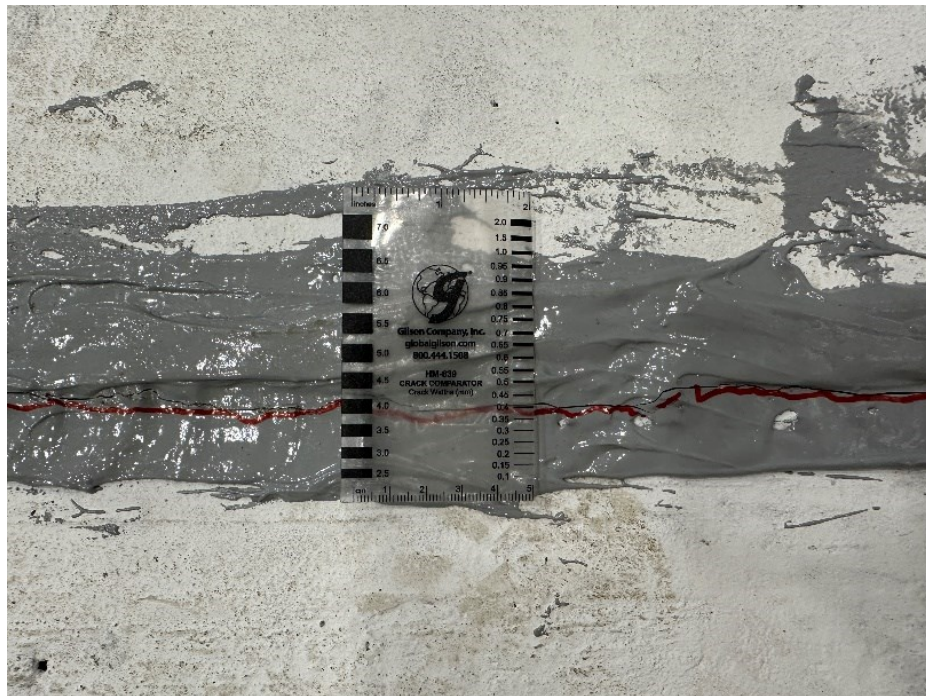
Concept D Static Testing Crack at Top Surface Transverse Joint at 5-kip Load Level.
